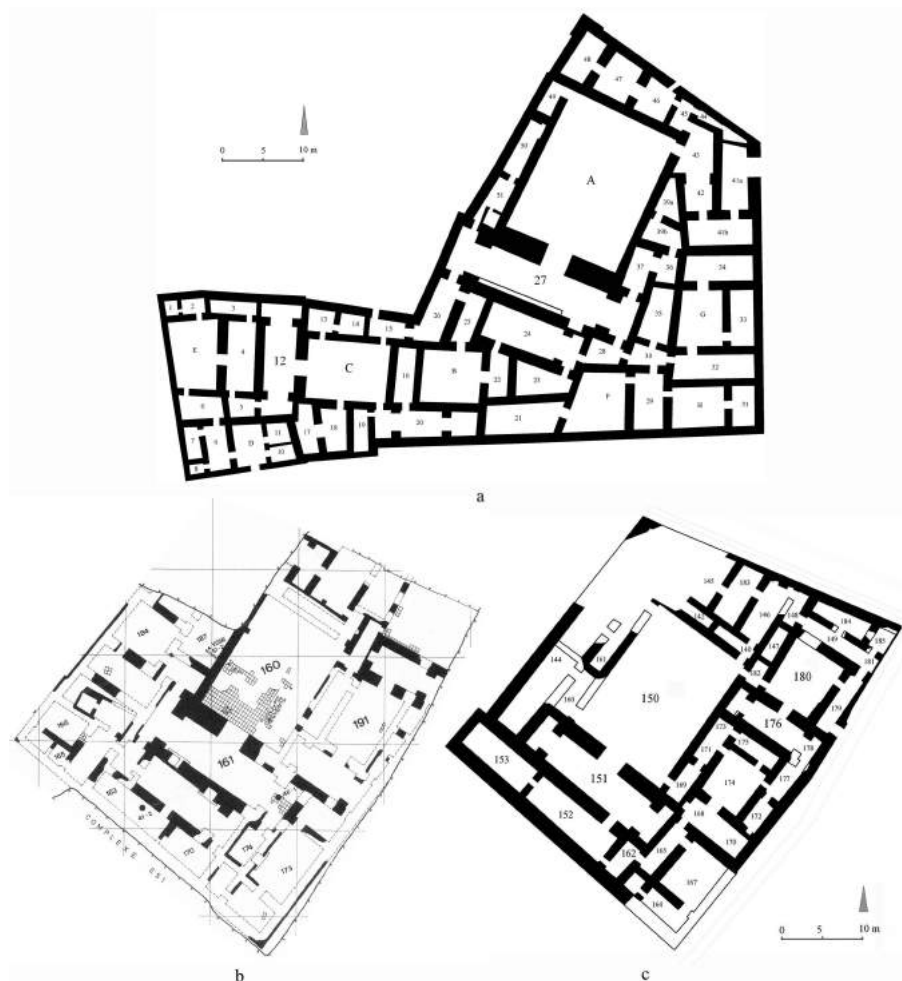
Schematic plan of large houses in *Ville Royale* A XIV and A XIII.
